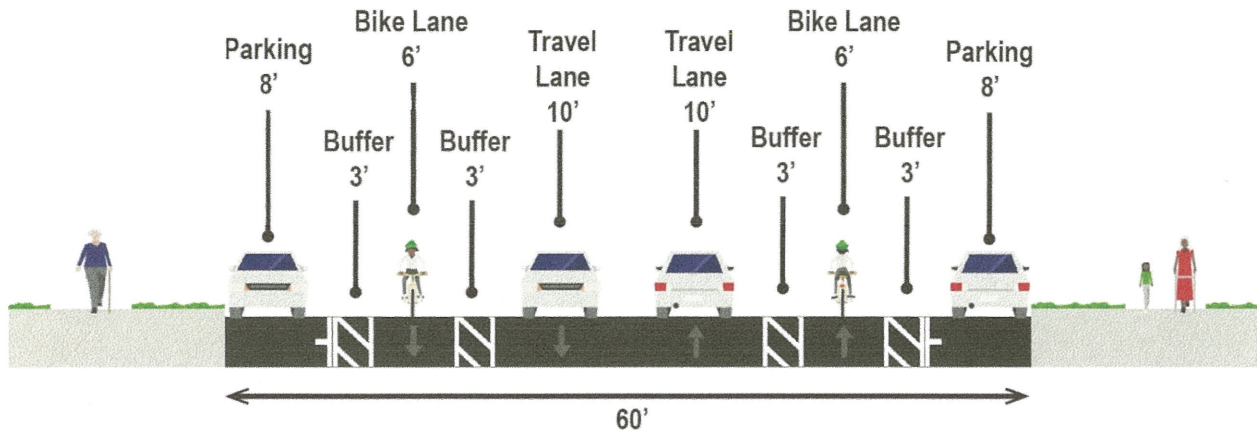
Proposed bicycle lanes, Franklin Avenue from Delilah Road through the ACE overpass
